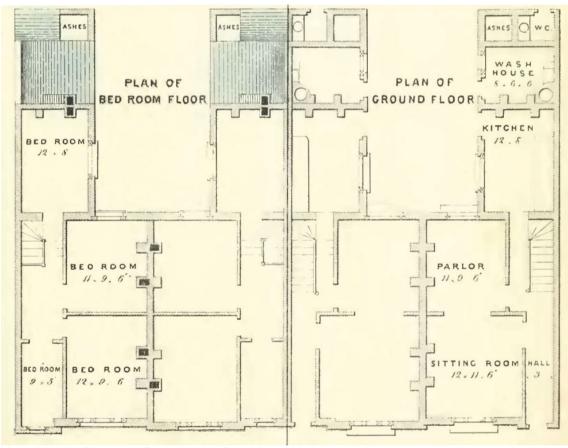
Similar ground floor plan type from *The Builder's Practical Director*, a popular pattern-book (A.H. Payne, *The Builder's Practical Director* [London: J. Hagger, 1855], p. 58).
